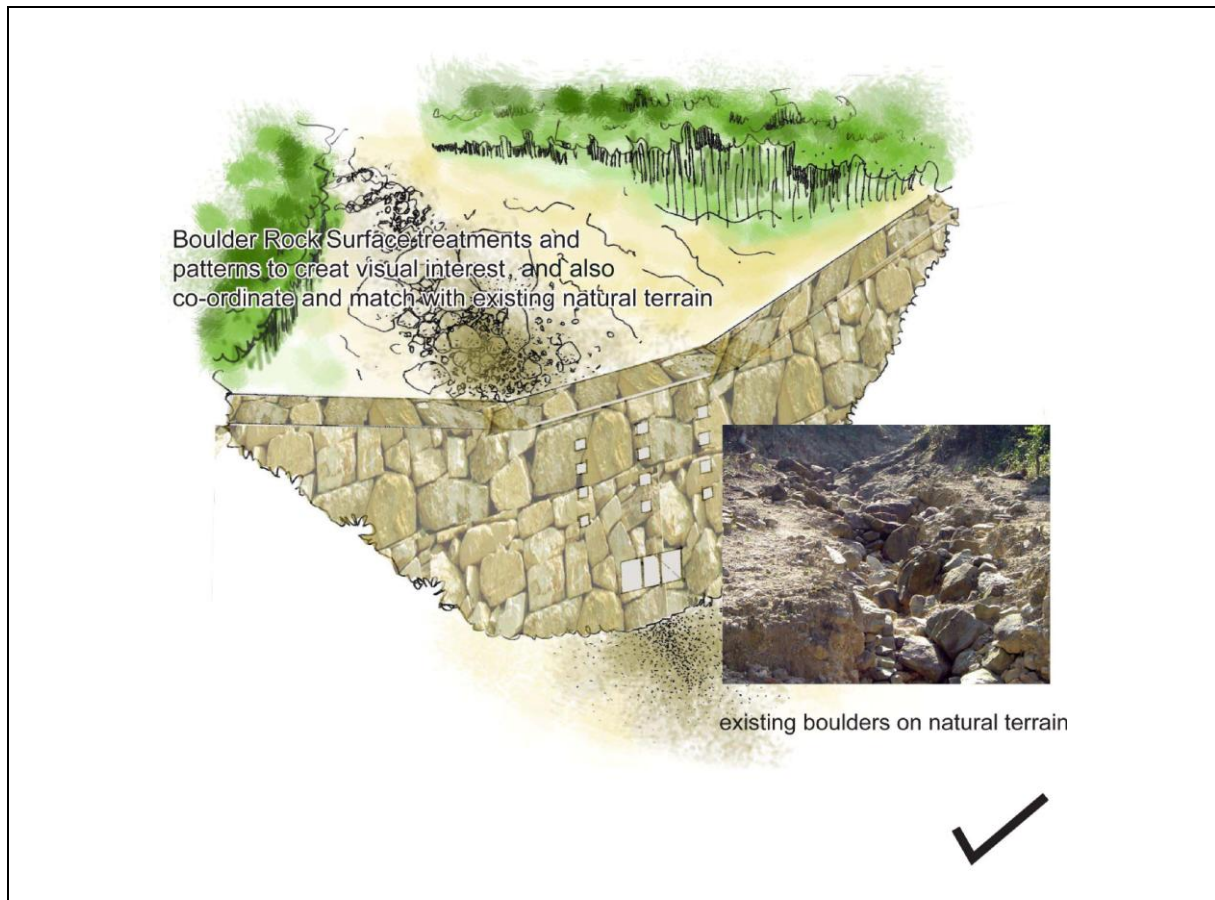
Use of Existing Boulders Found on Site as Wall Finishes
